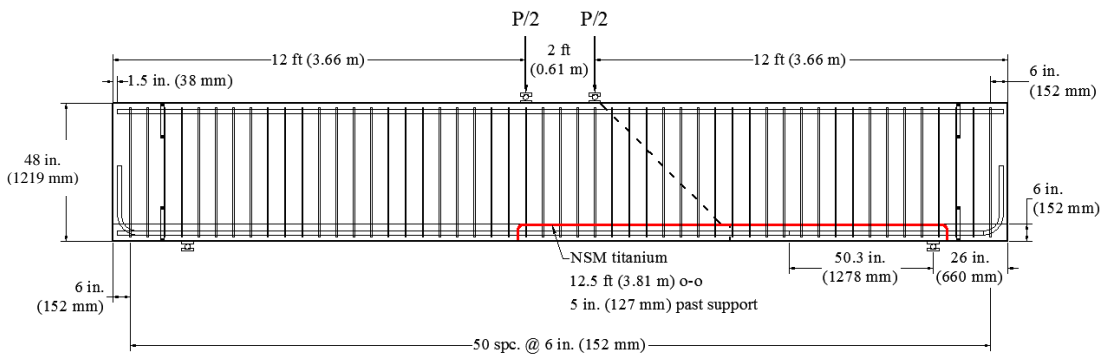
Elevation of specimen IT.45.Ld3(6).Ti.
